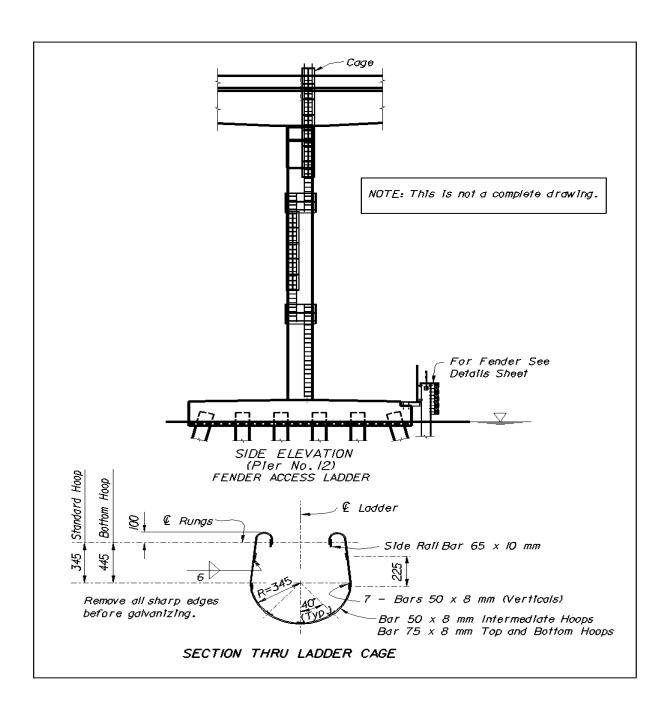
Fender Access Ladder (Typical Side Elev.)
